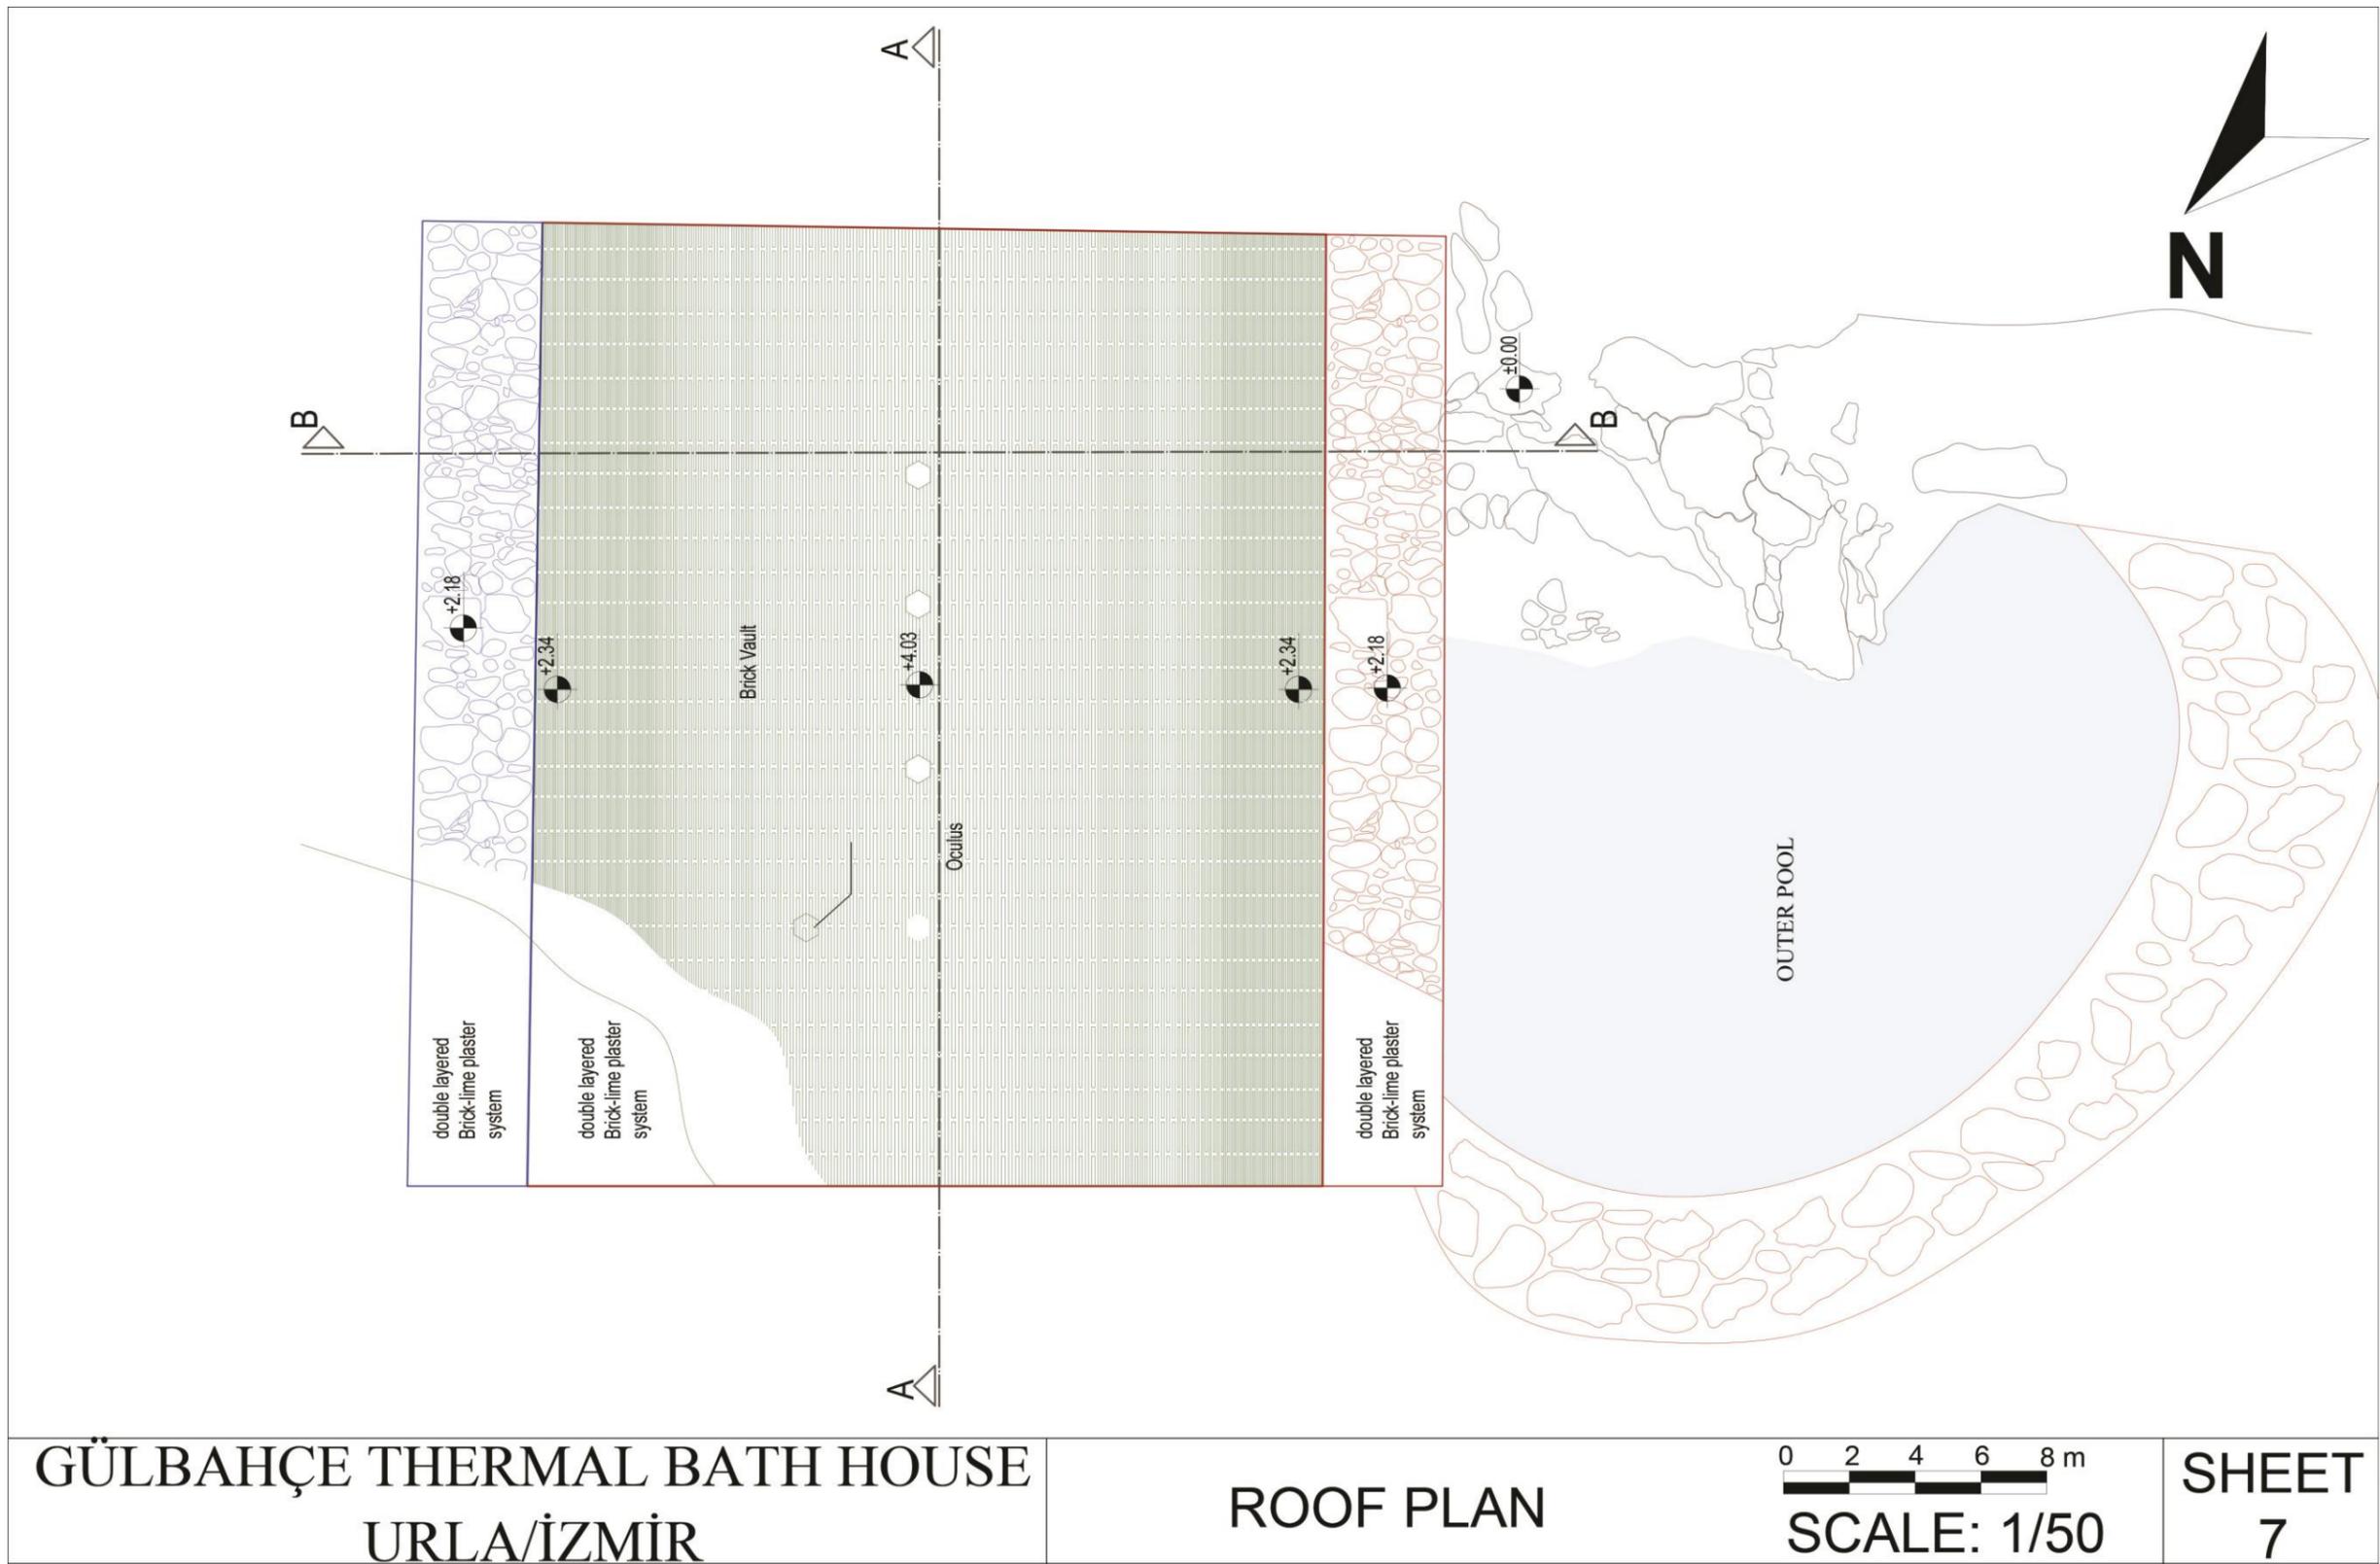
Roof Plan -Restitution (Source: İYTE,2019)
